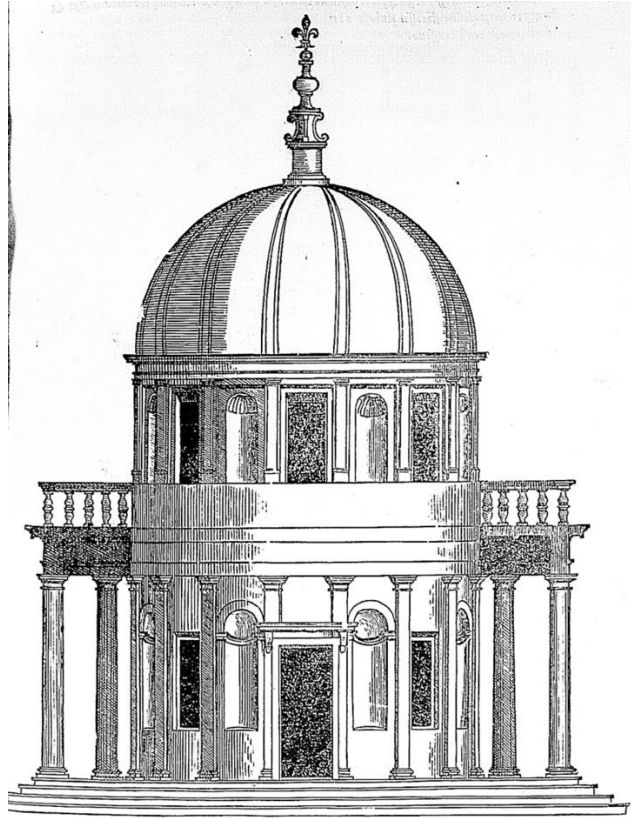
Elevation of Tempietto by Sebastiano Serlio. (1560)
